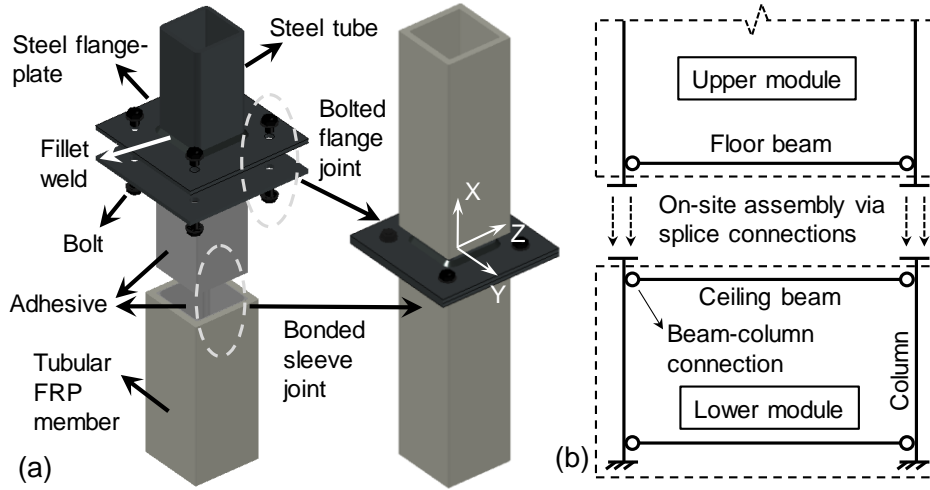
(a) Proposed splice connection for tubular section FRP members; and (b) potential application to FRP modular buildings.
